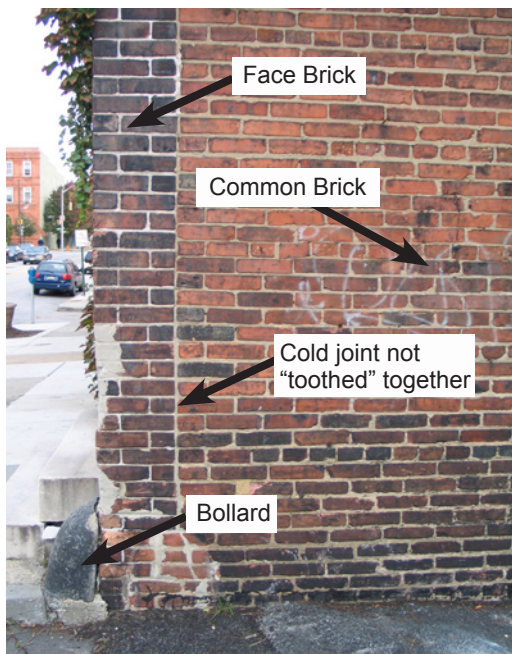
The vertical joint where the face brick joins the common brick (Author)
